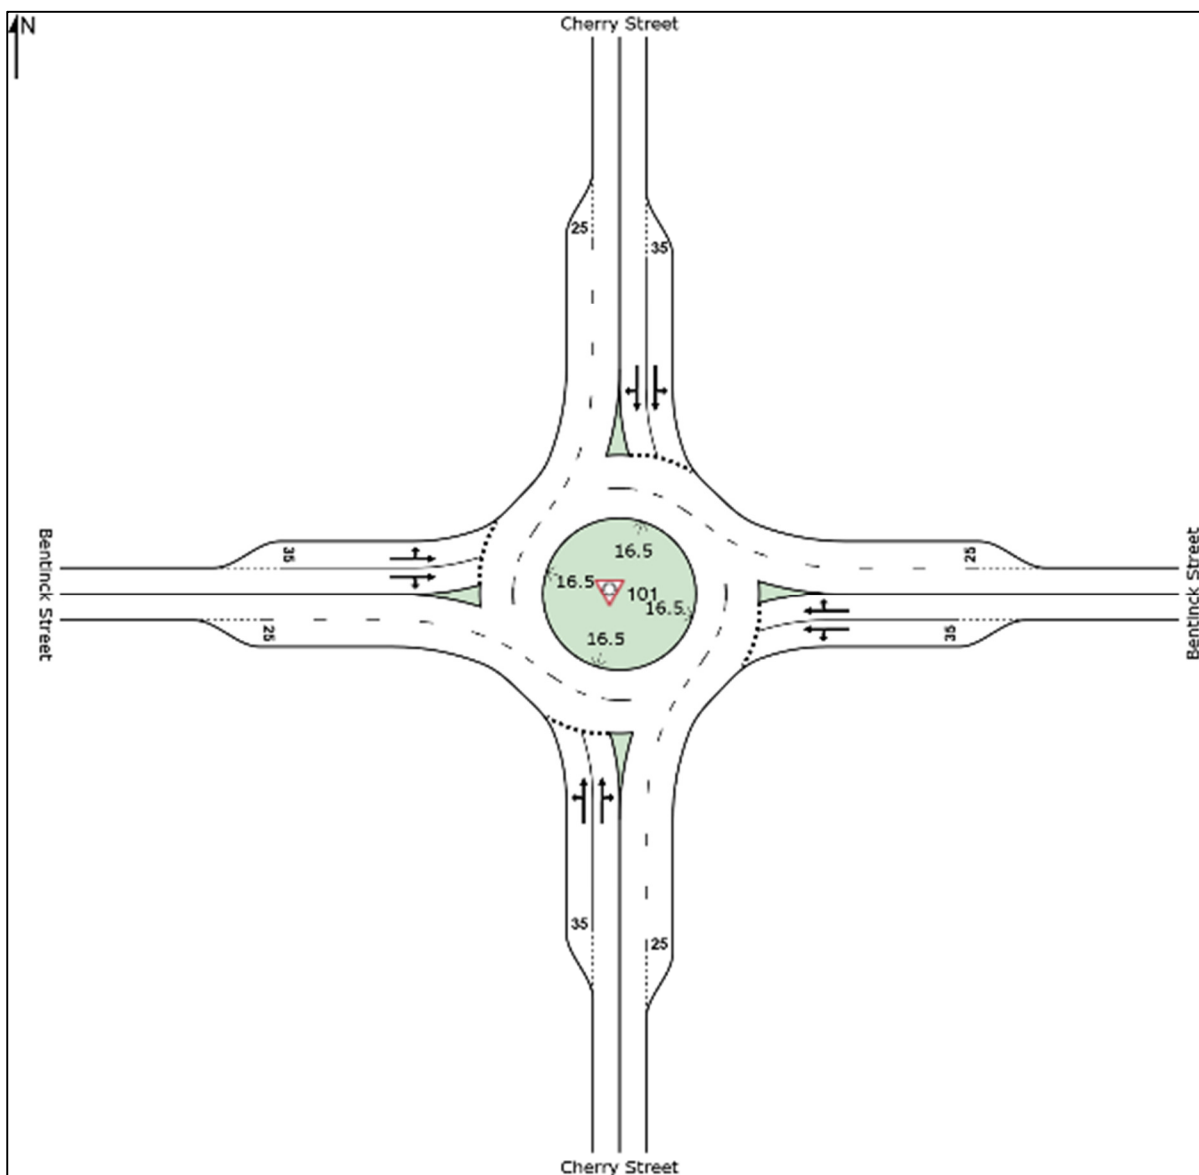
Cherry Street and Bentinck Street Intersection Layout
